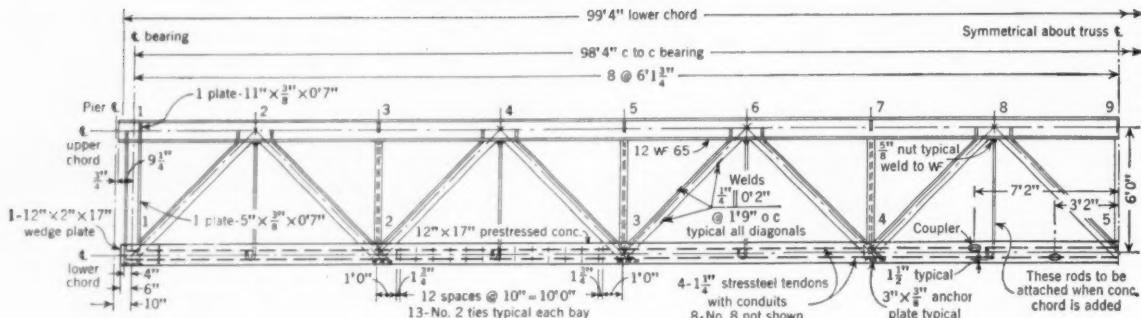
Truss elevation of two 100-ft spans shows prestressed-concrete lower chord with structural-steel web and top chords.
